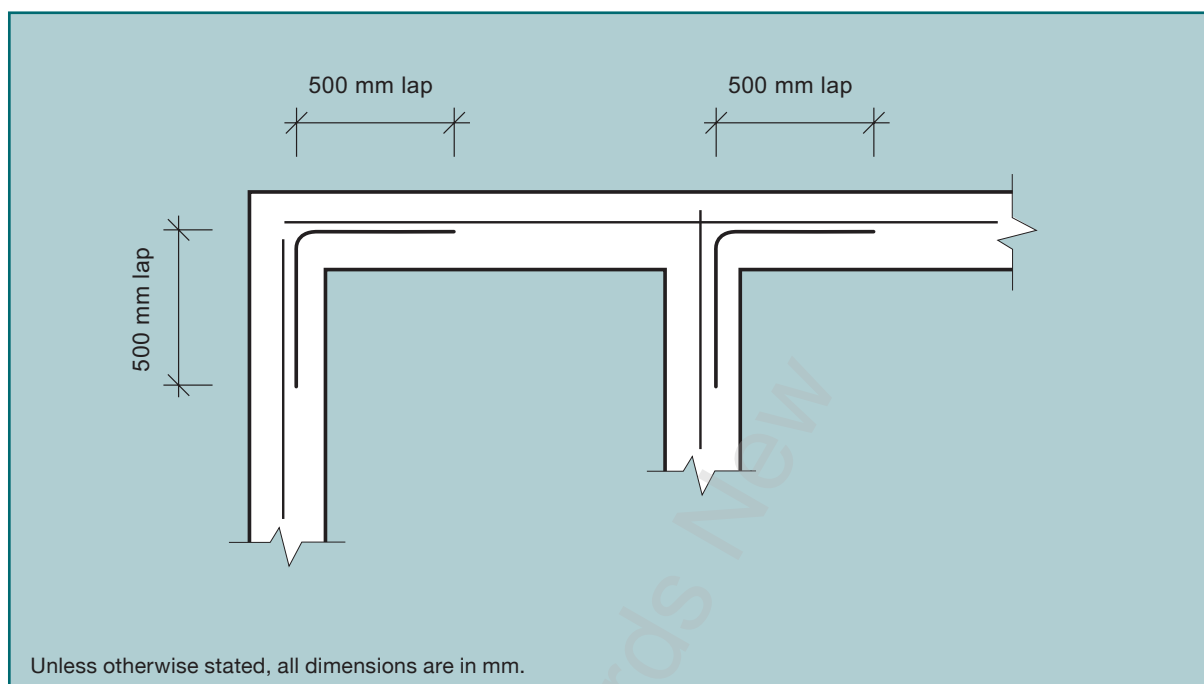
(a) – Horizontal reinforcing lap length for foundation walls (see 6.11.7.2)
